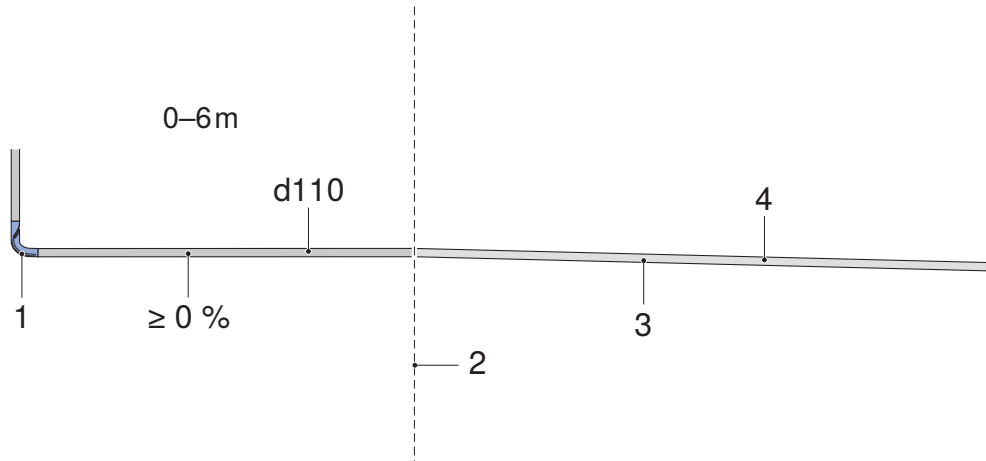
Transition of a stack with Geberit SuperTube to the collector pipe
